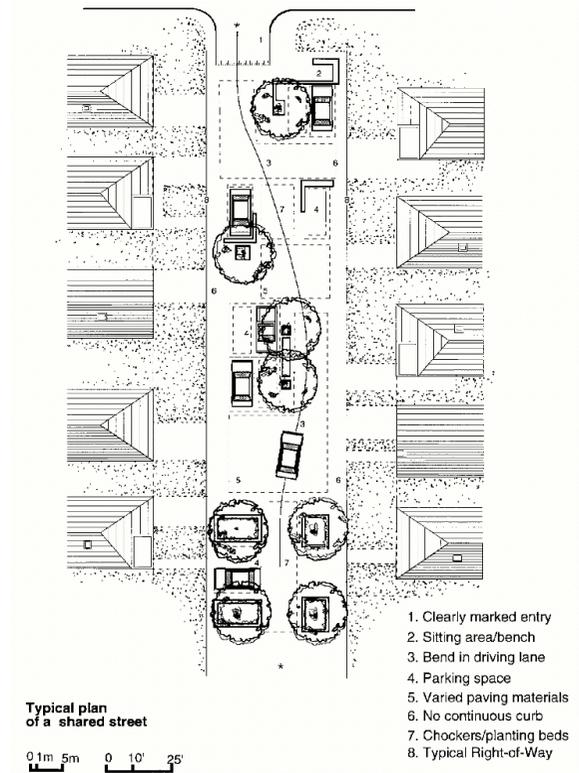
, Shared street and typical street sections, Streets and the Shaping of Town and Cities Eran Ben-Joseph (1997)
